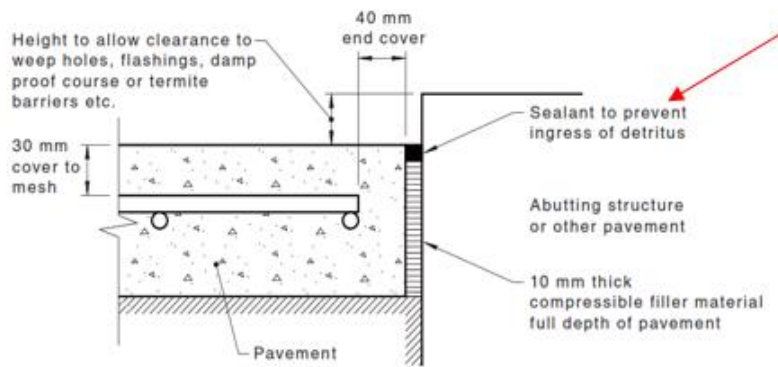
TYPICAL ISOLATION JOINT
